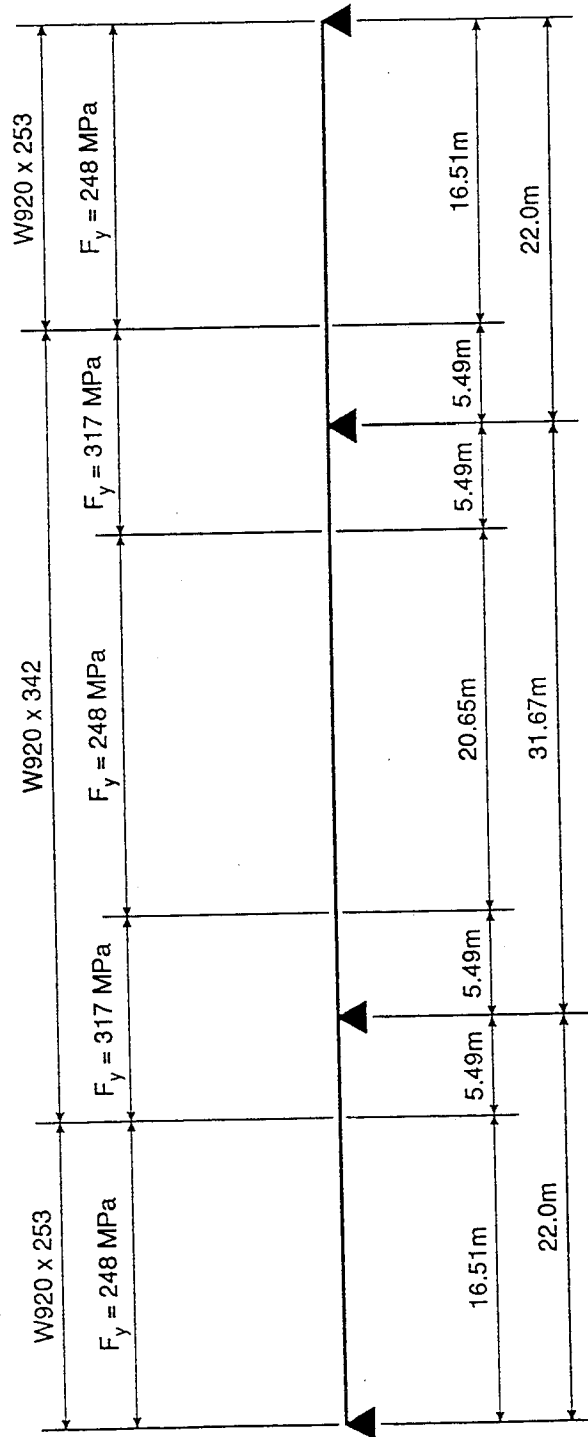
Girder Details for the 3-Span Continuous Bridge at the CBD Interchange
